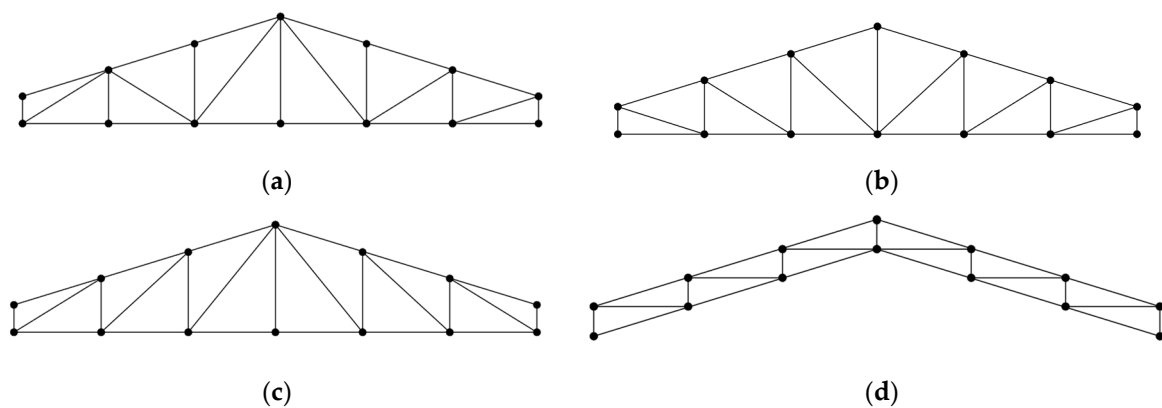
Trapezoidal trusses: (a) Fan truss, (b) Howe truss, (c) Pratt truss, and (d) parallel chord truss.
